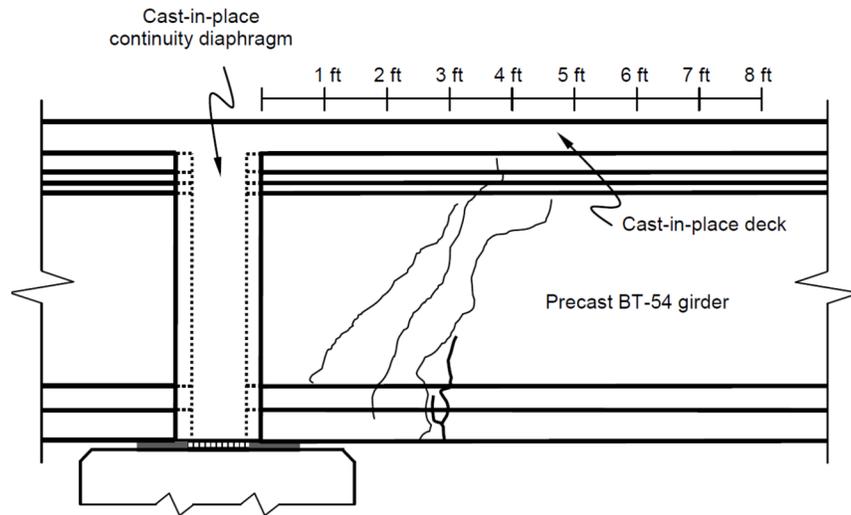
Cracking pattern in the end region of a precast girder [36]
